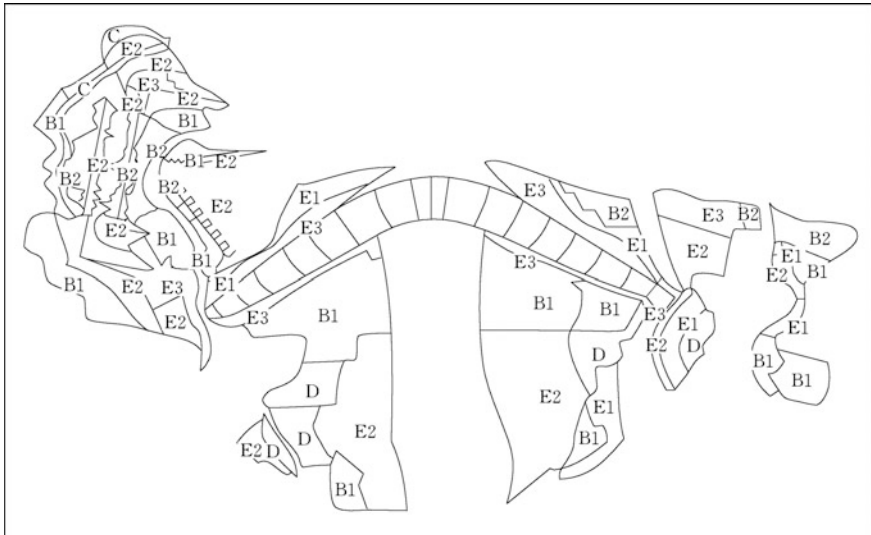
Plan showing the final shallow reinforcement scheme
